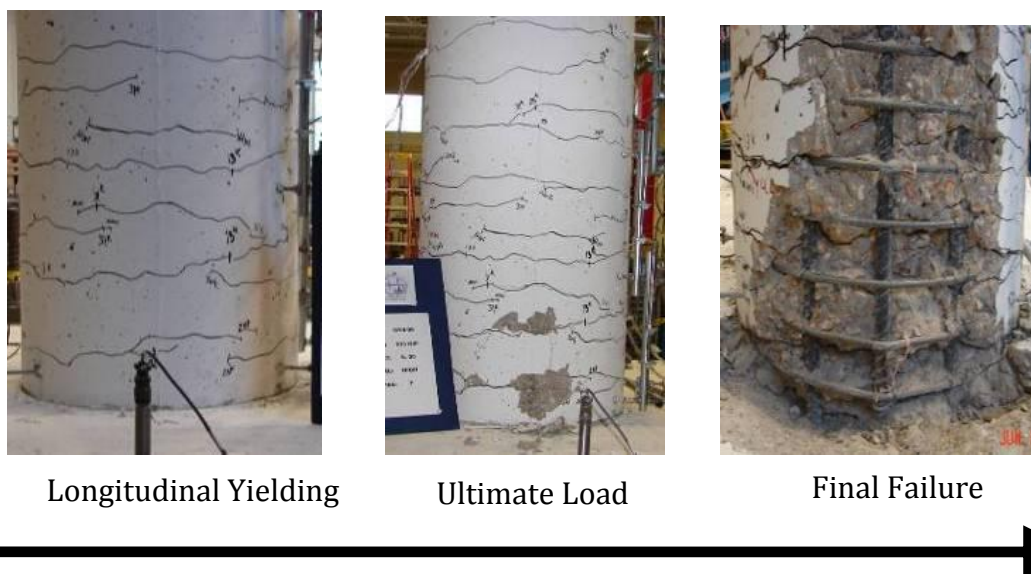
Damage to Column Missouri-H/D(6)-2.10%-0.73%-6.16% under Flexure
